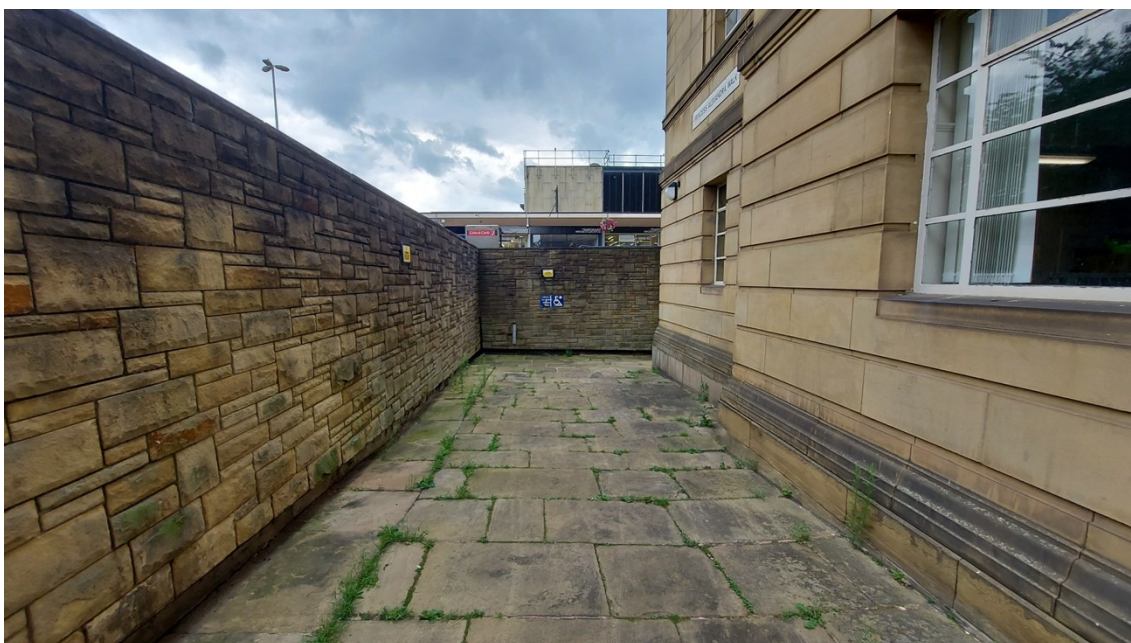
The sunken area to the east of the Library and Art Gallery with modern retaining walls.
